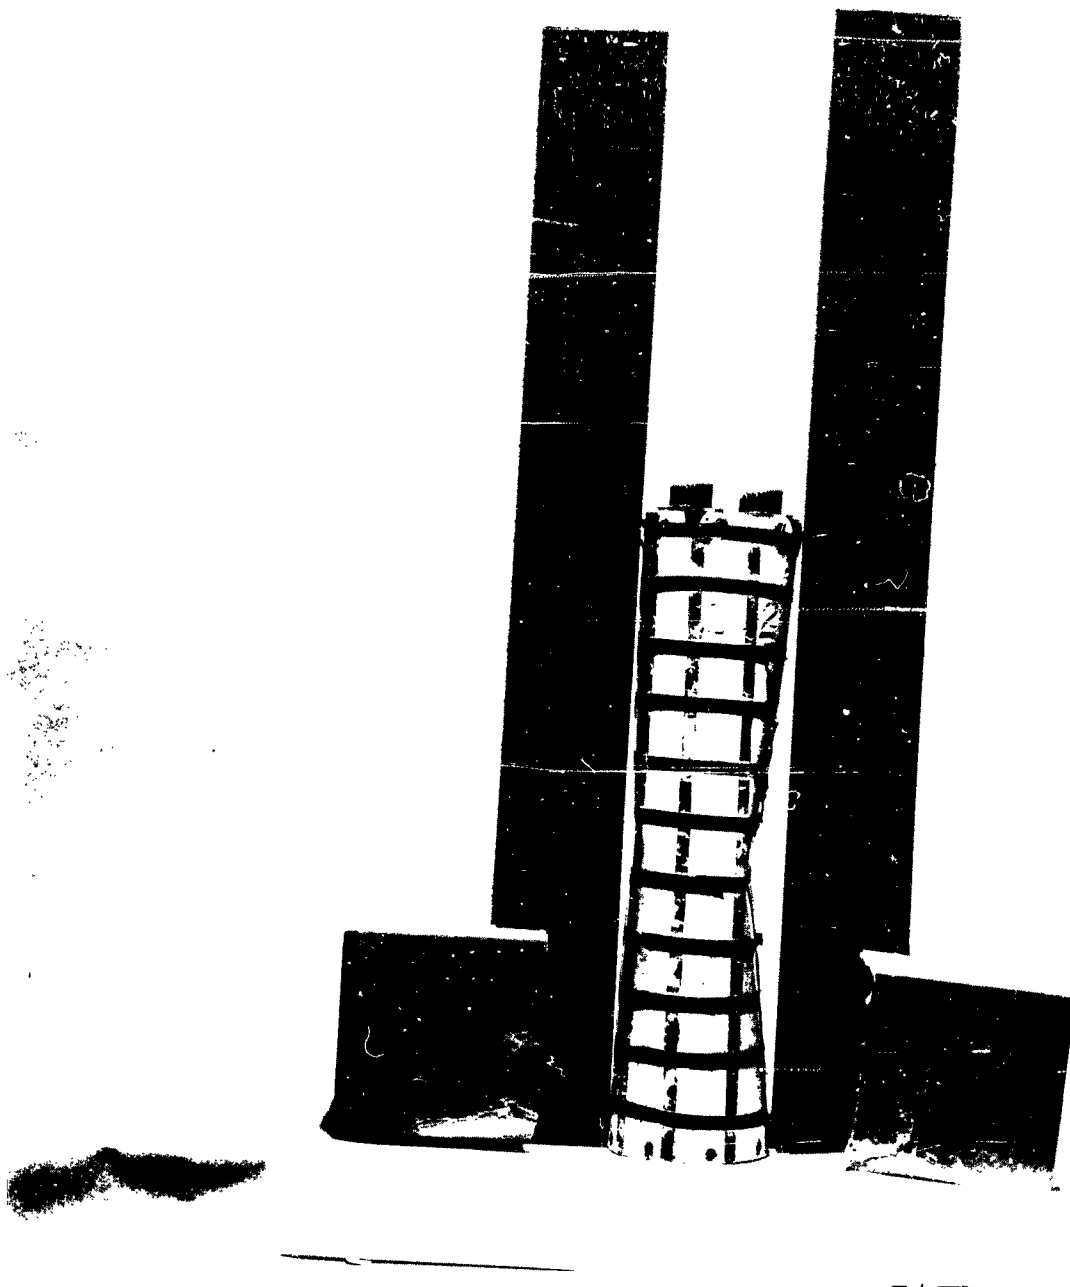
SHELL NO. 8 - SIDE VIEW
